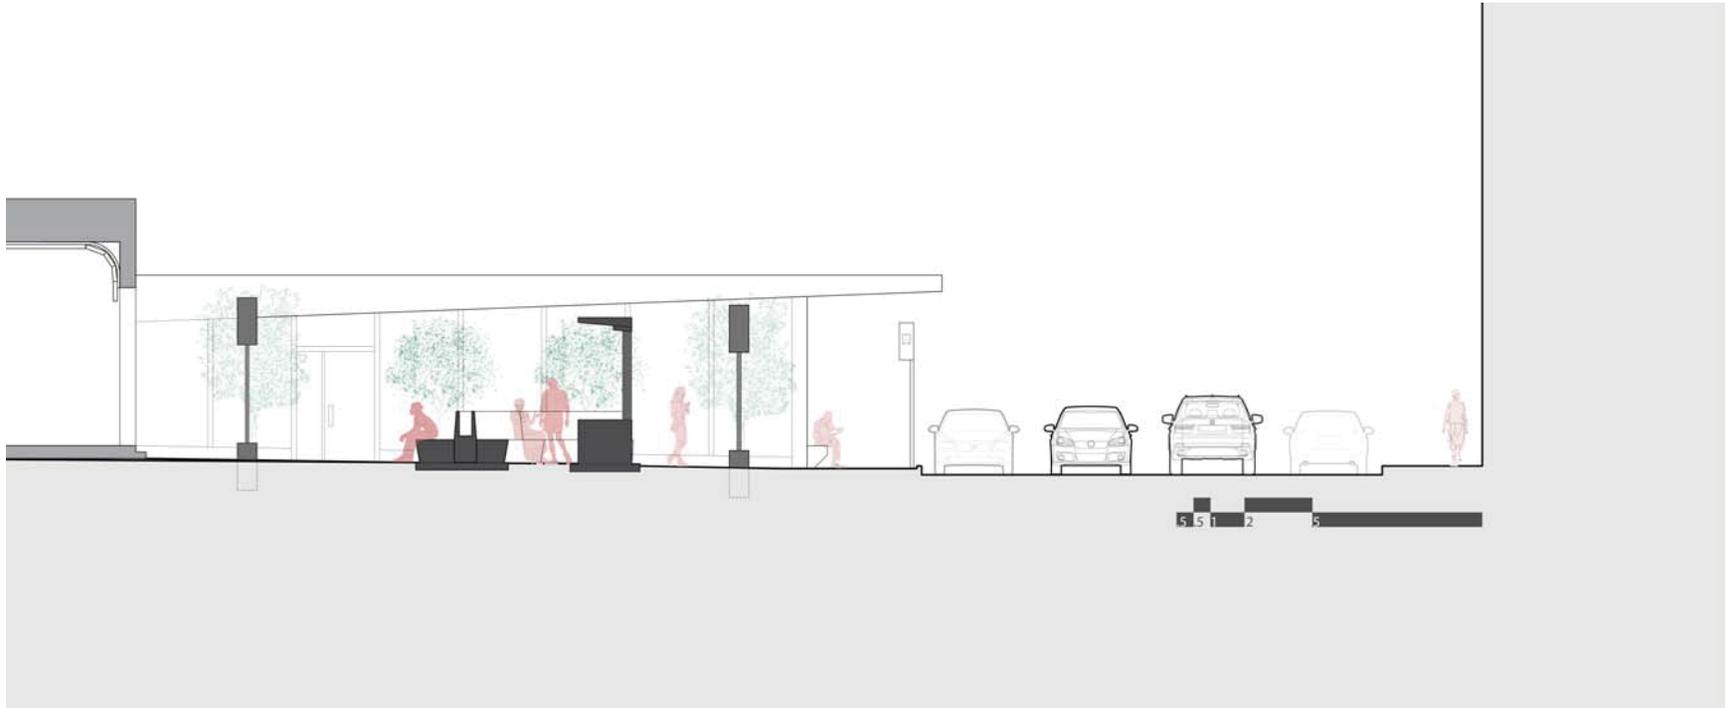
Small - Plaza - Section - Seven Bays to Street
